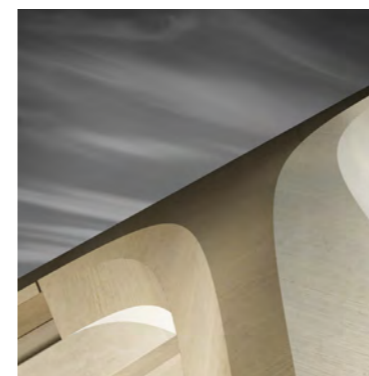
Concept of sculptural shaped forms applied to bridge pier
